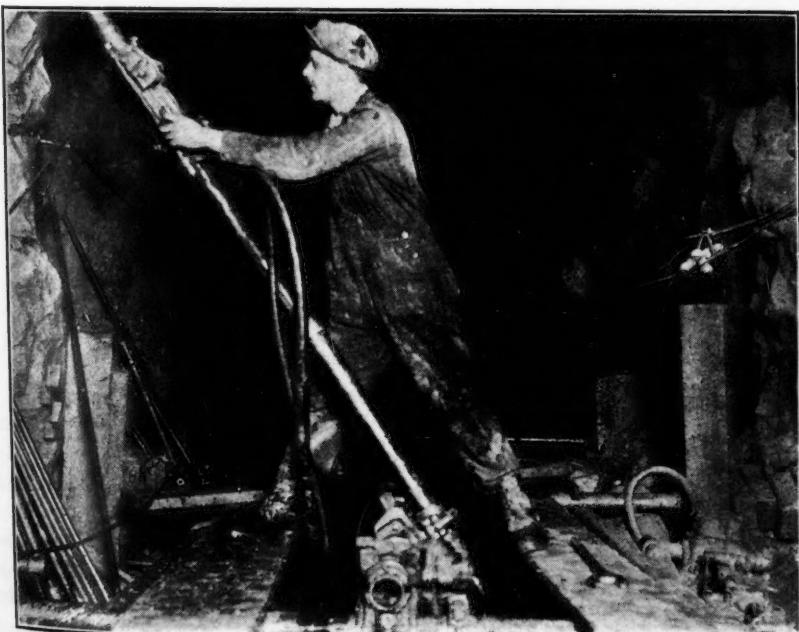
RING DRILLING, MOFFAT TUNNEL, EAST PORTAL.
